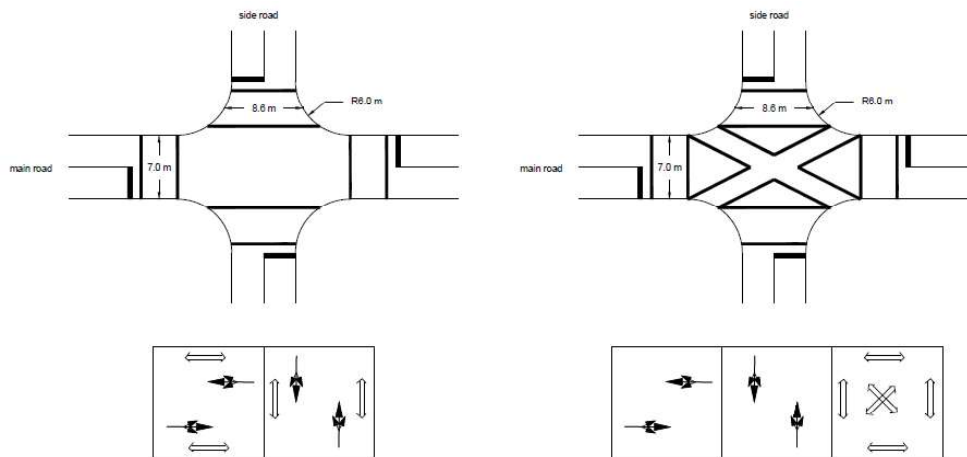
Intersection layout with different signal plan types: tradition signal plan (left) and EPP signal plan (right)
